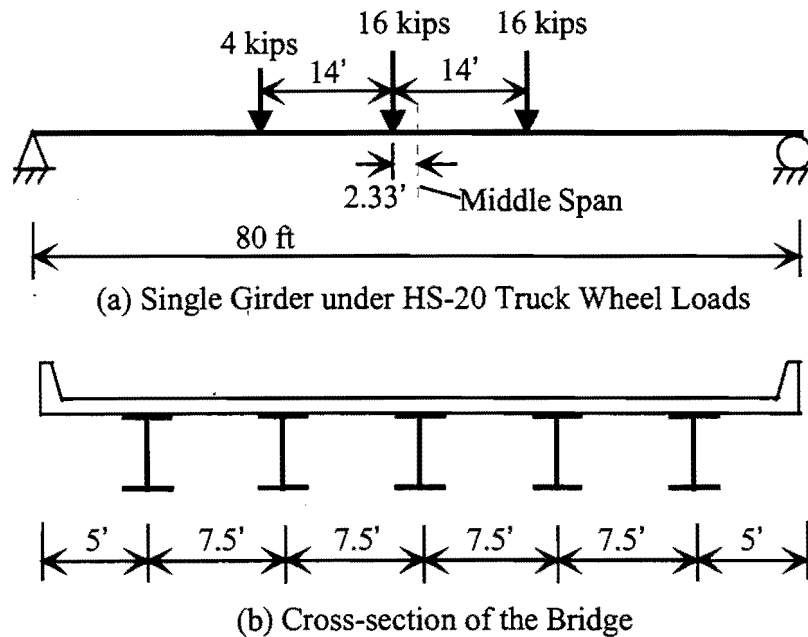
A Simply Supported Bridge with I-shaped Girders
